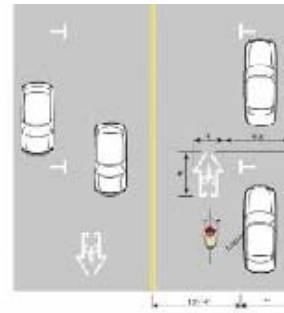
Waldorf Alley – Recommended section if rear of buildings have frontage on alley adjacent to light rail line.
